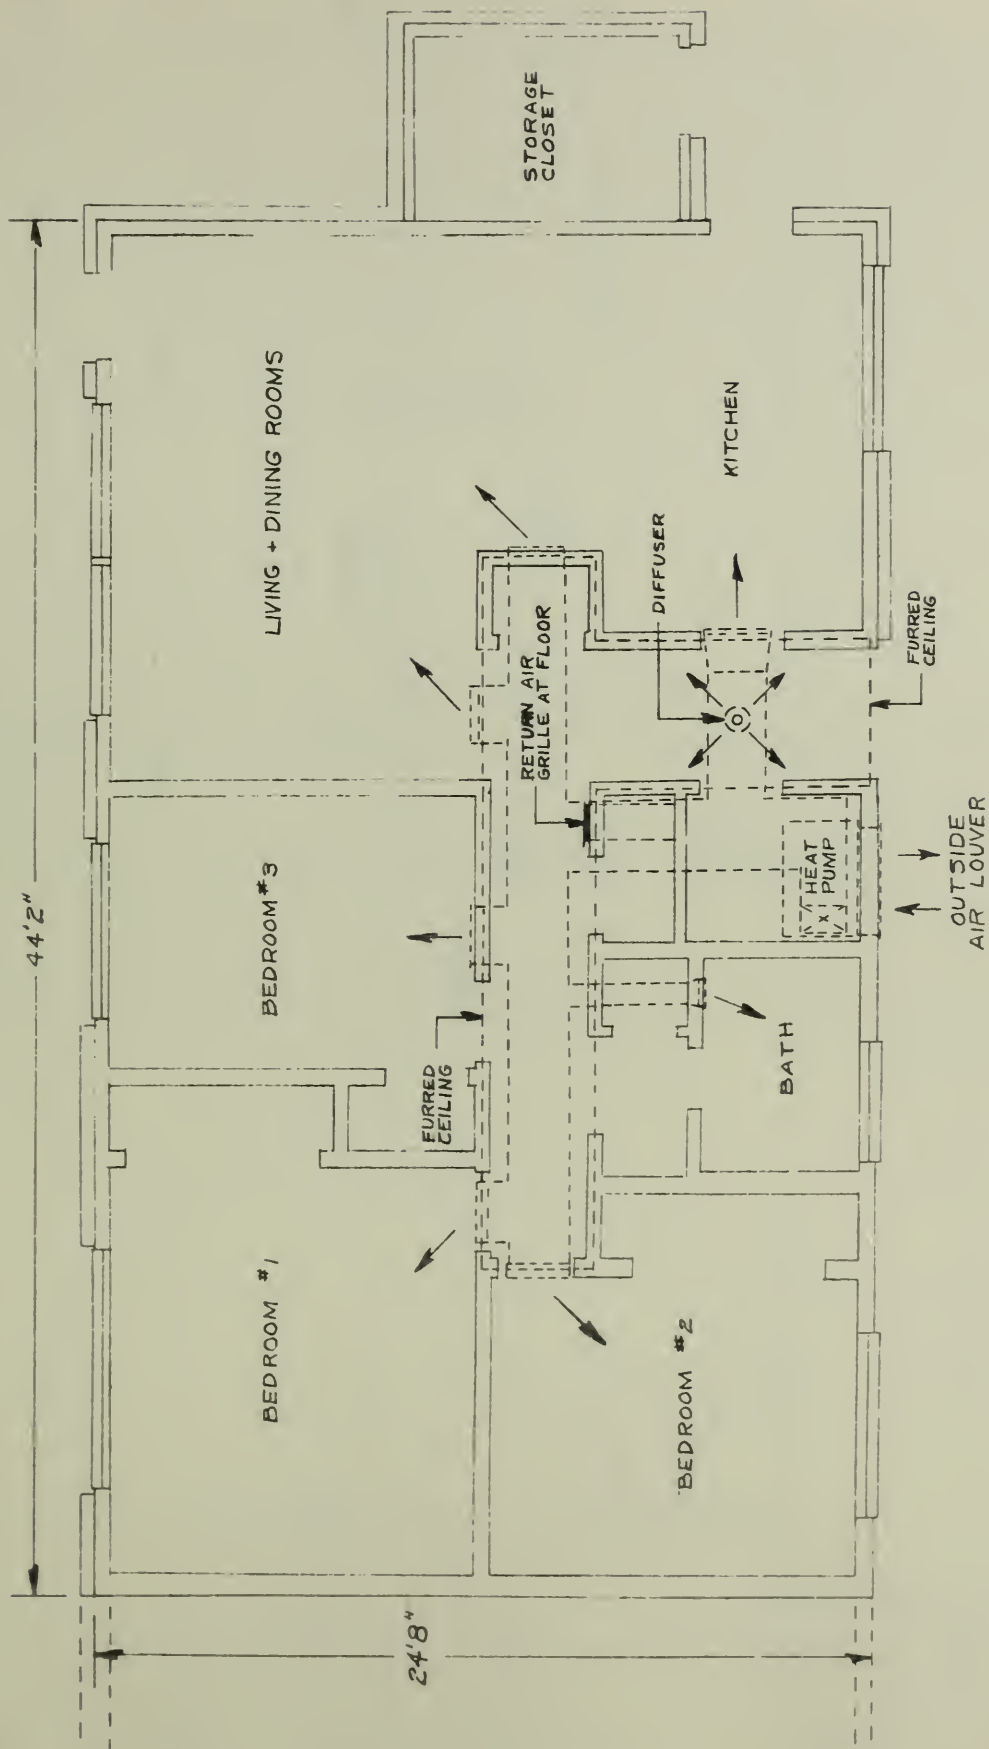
Plan View of Type A3D1 House, Columbus Air Force Base
